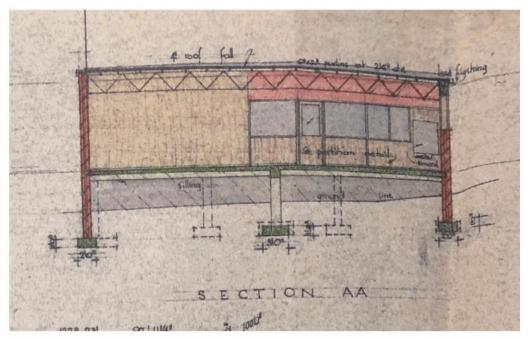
Section of the c1961 building, showing the fill used sub-slab for levelling. Tasmanian Archive and Heritage Office AE417/3/1562.
